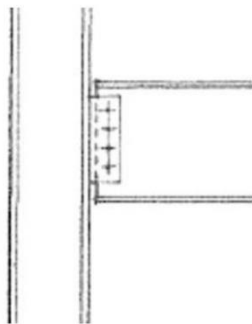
STRUCTURE SYSTEM DETAIL A
